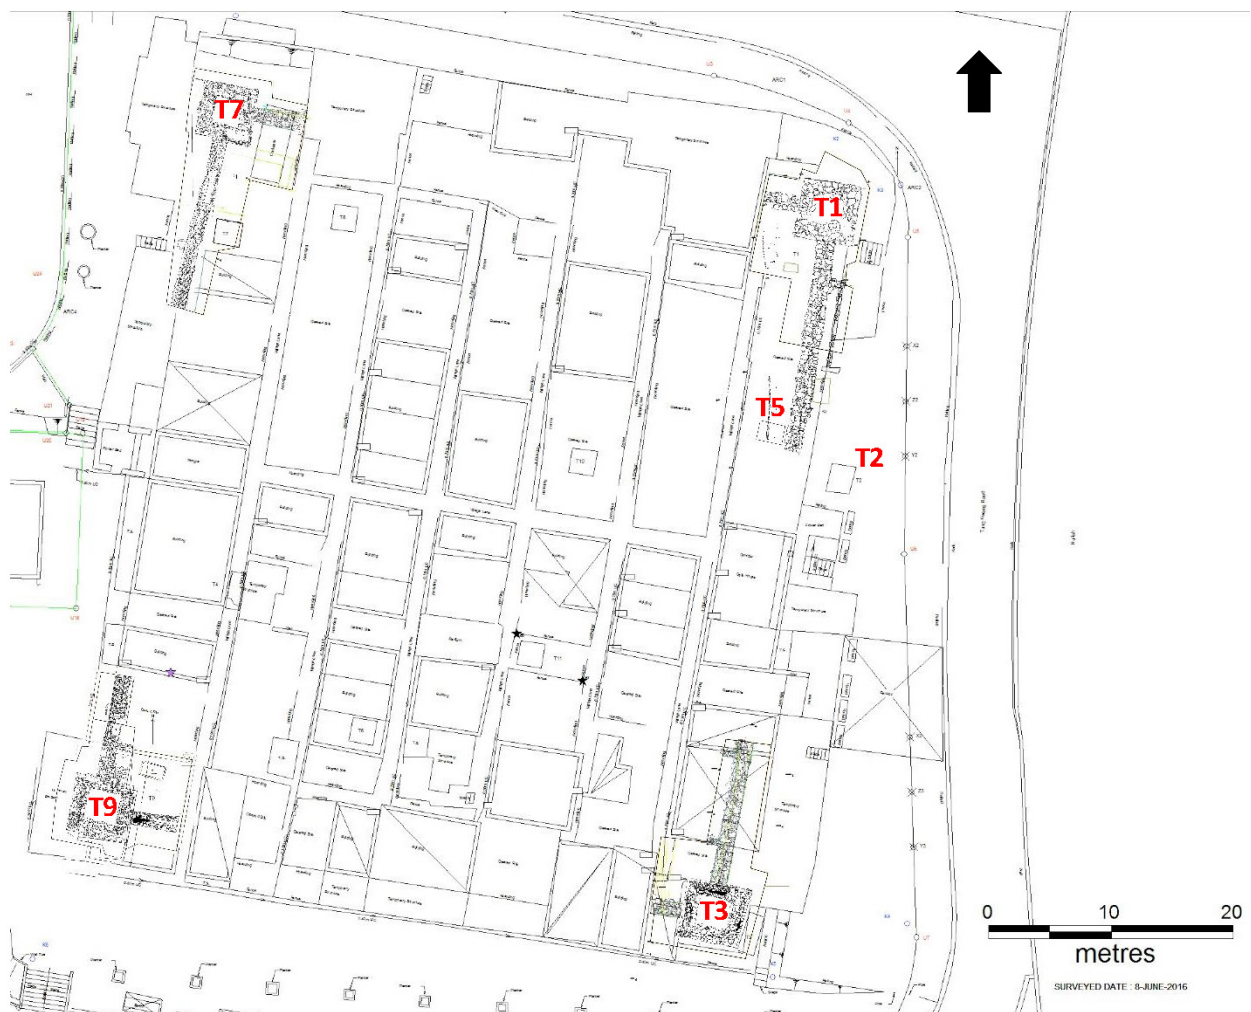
Ground plan showing the extent of the enclosure walls and watch towers pre-Stage 1 excavation.
